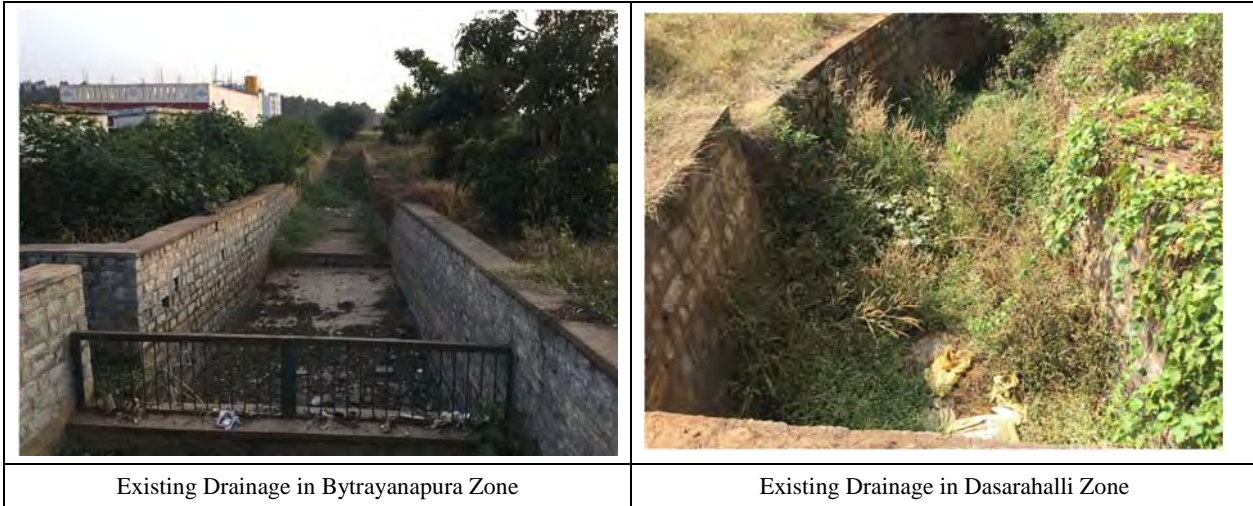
Typical Drainage, along which Sewer Line is Planned
